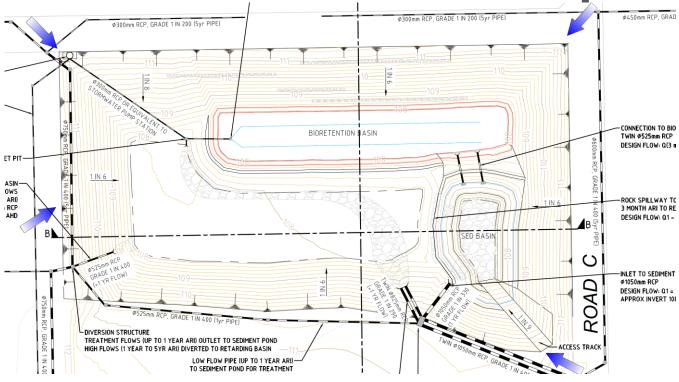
Reeds Consulting Catchment 1 Functional Design Plan.
